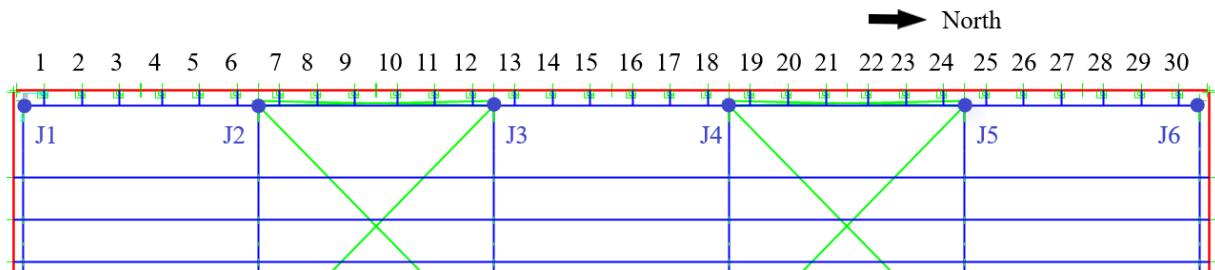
Joint and RFC Identification along West Wall for Models 41 and 138 (Plan View)
